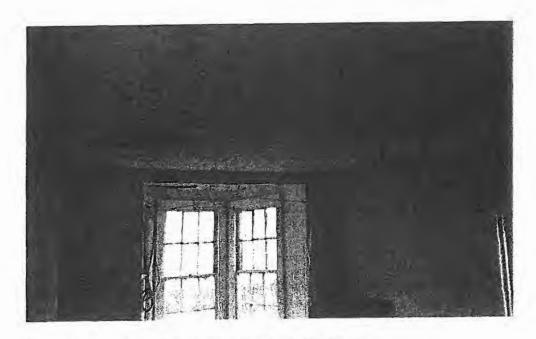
Water Damage at Ceiling and Cracks in Wall Plaster
